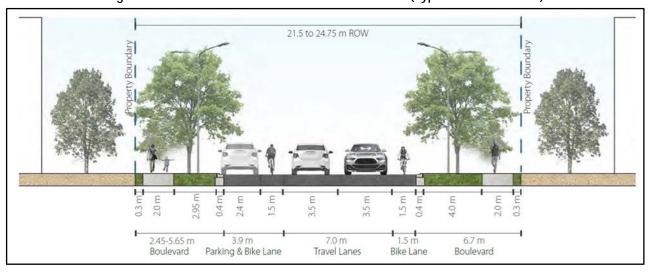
21.5m ROW Collector Road (Typical Cross-Section)
